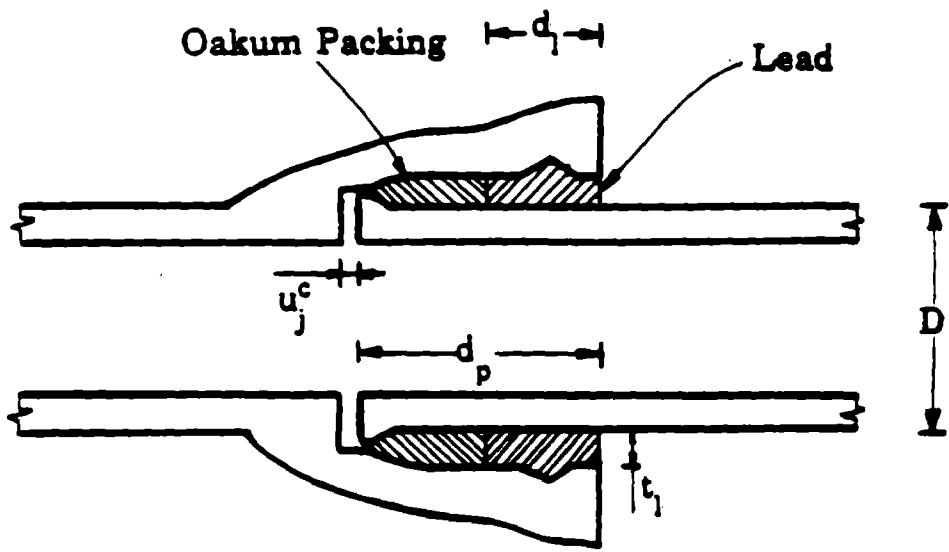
Cross-Sectional View of Lead Caulked Joint
